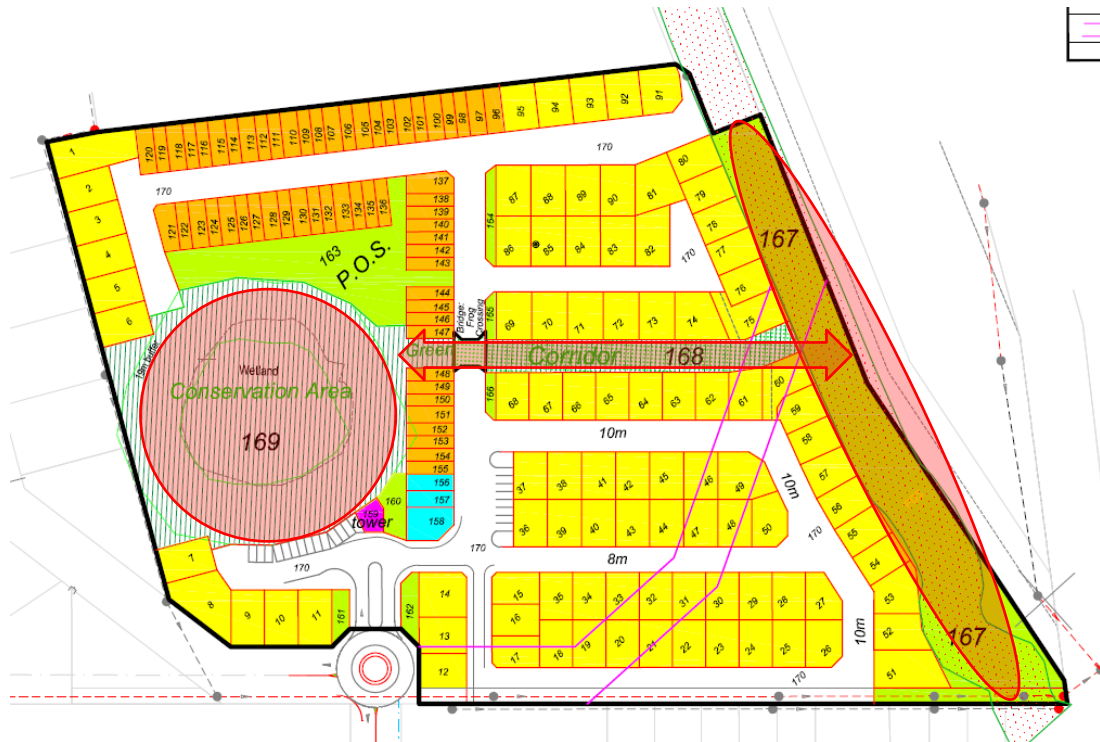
Approved layout plan for the study site extending into the on-site and Camphersdrift Wetland (2018).
